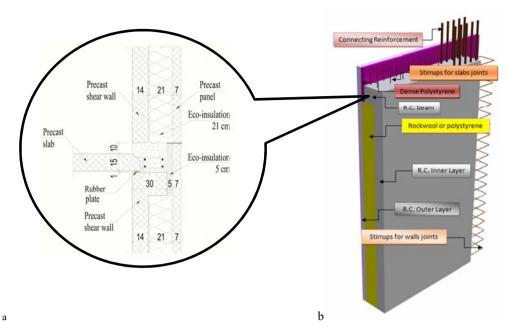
(a) Horizontal wall joint; (b) Vertical wall joint
